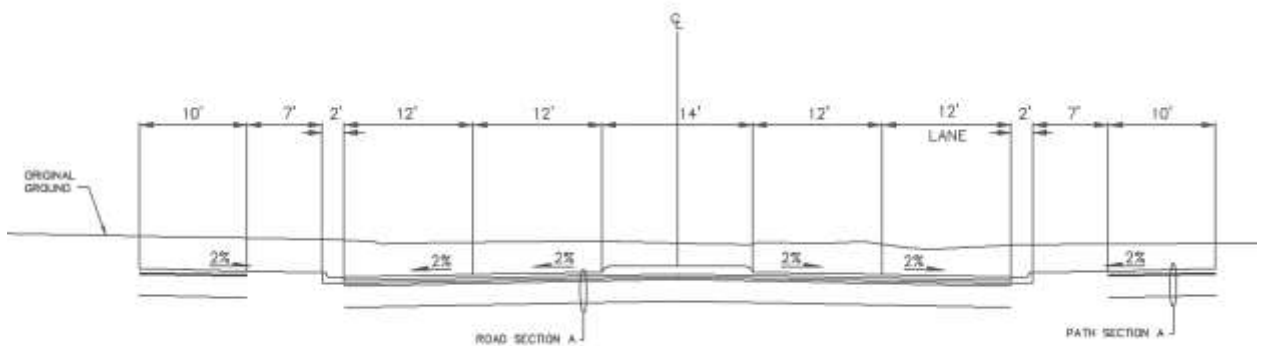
East 92nd Avenue (STA. 18+50 TO STA. 27+00)
